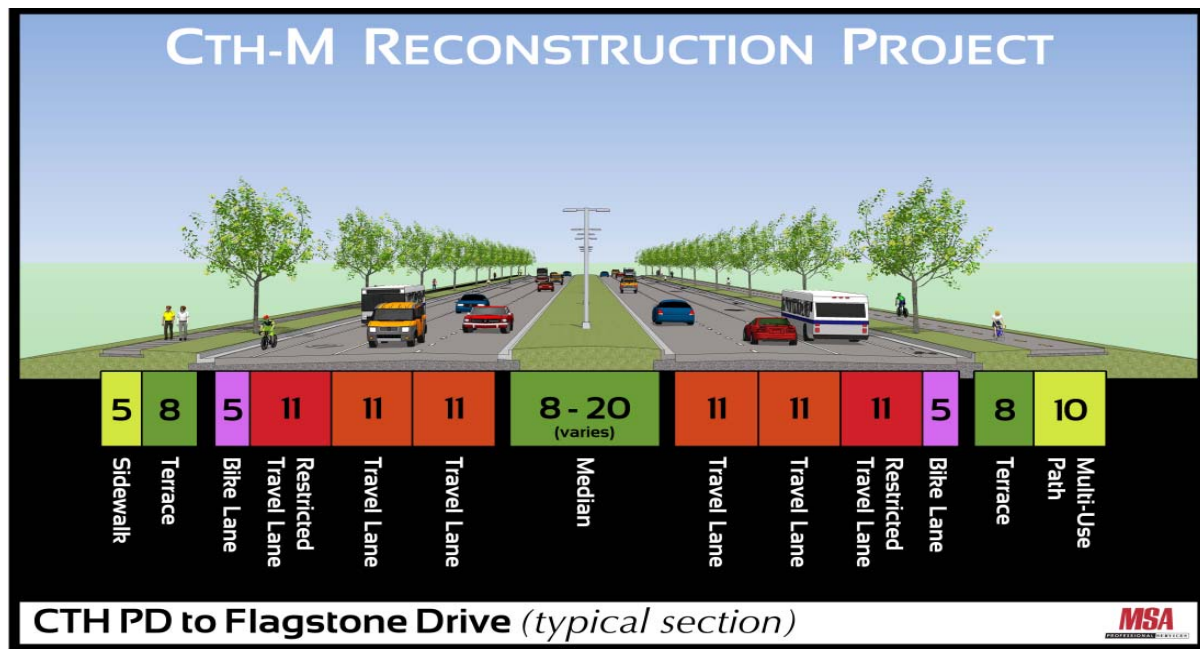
Example CTH M proposed typical section from CTH PD to Prairie Hill Road.
